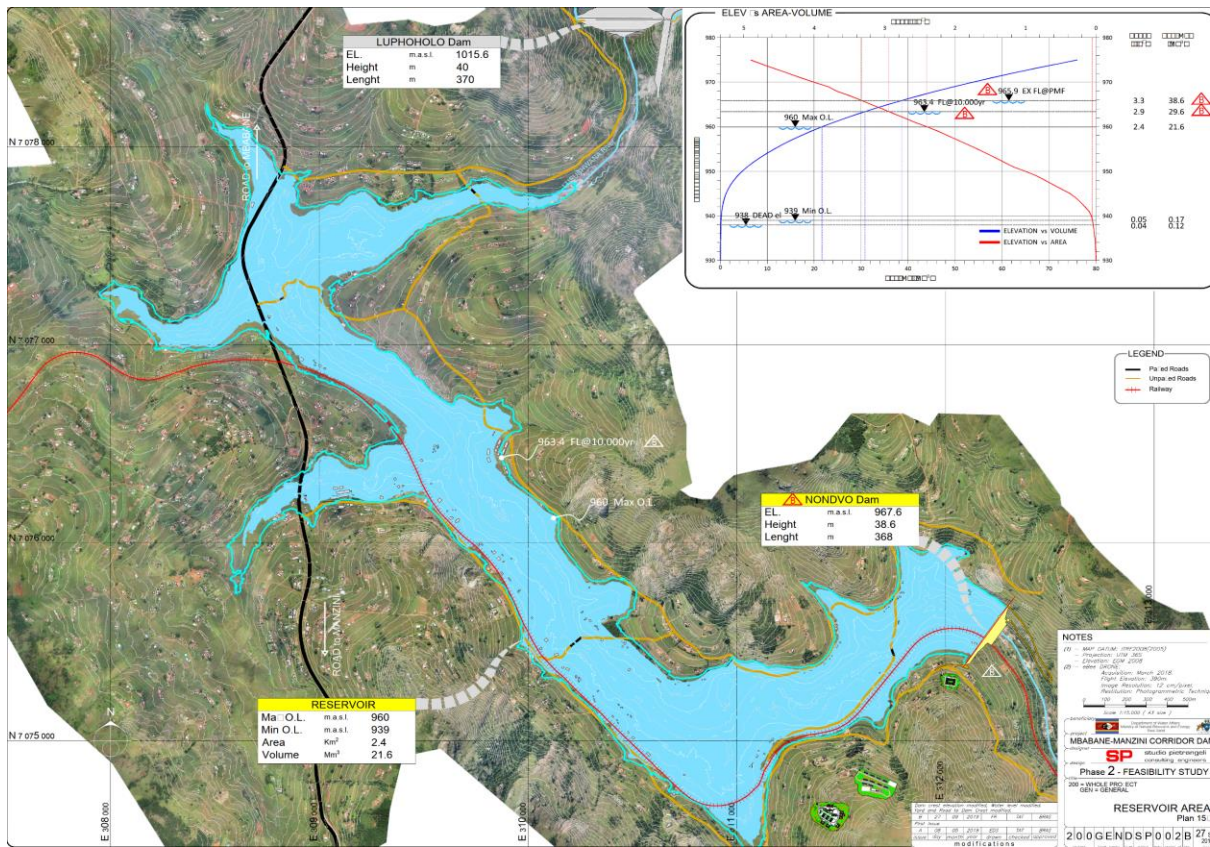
Layout of the Dam wall, reservoir area along with associated infrastructure
